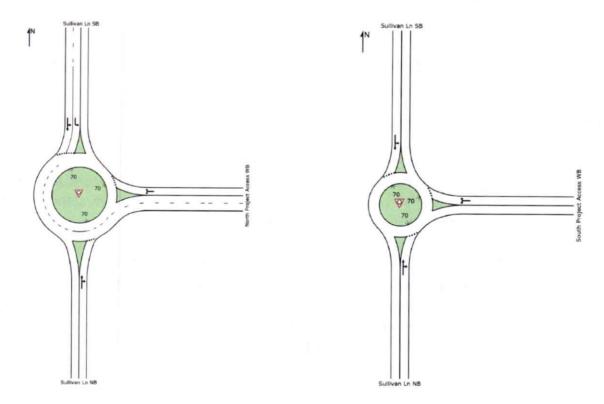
Proposed Roundabout Configurations – Project Access Locations
